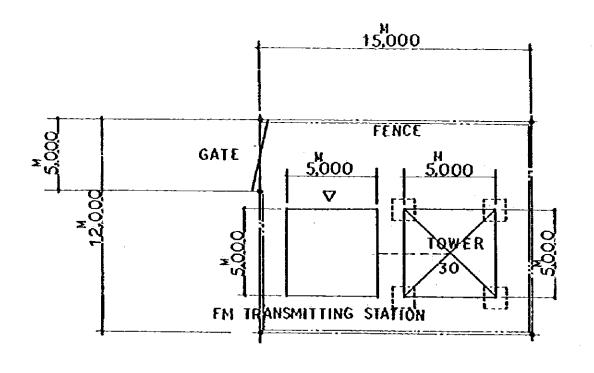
FLOOR PLAN, SITE PLAN & OUTLINE OF TOWER
